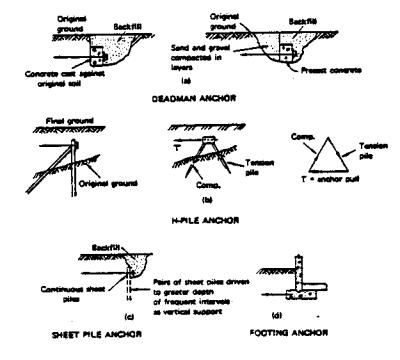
Types of anchorage (Teng, 1962, p. 374)
